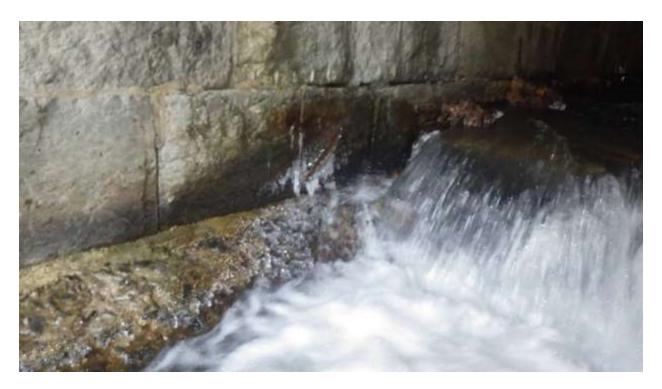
View of northern sidewall of the north barrel showing where the stone floor washed away and undermining of the concrete toe wall installed in 2014
